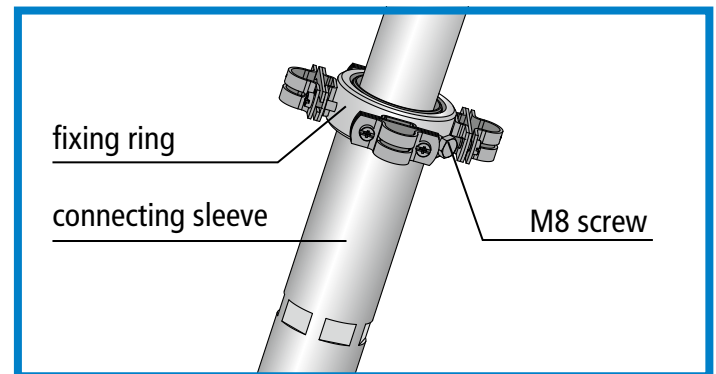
Step 1 for installing a HVI®long Conductor outside the supporting tube
